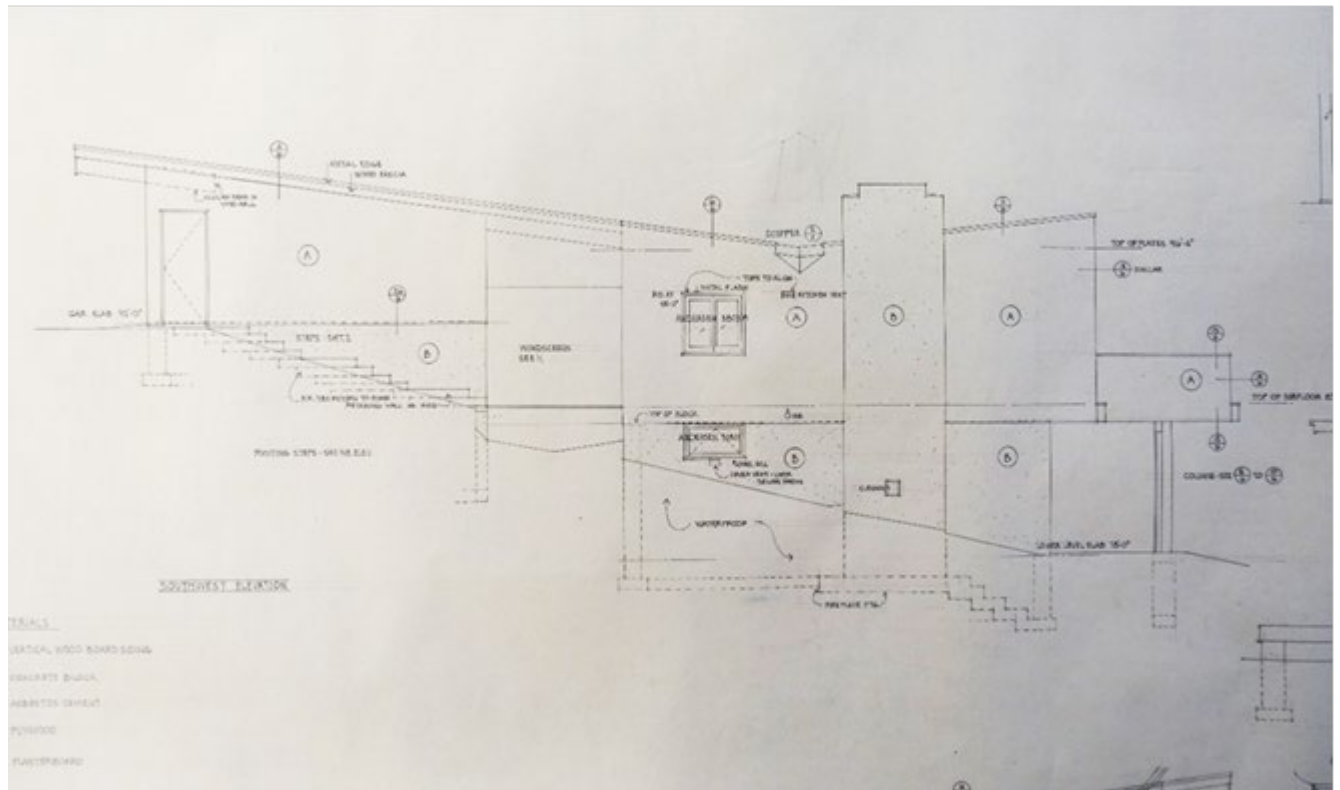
Working drawing, southwest elevation. Close Associates Papers
